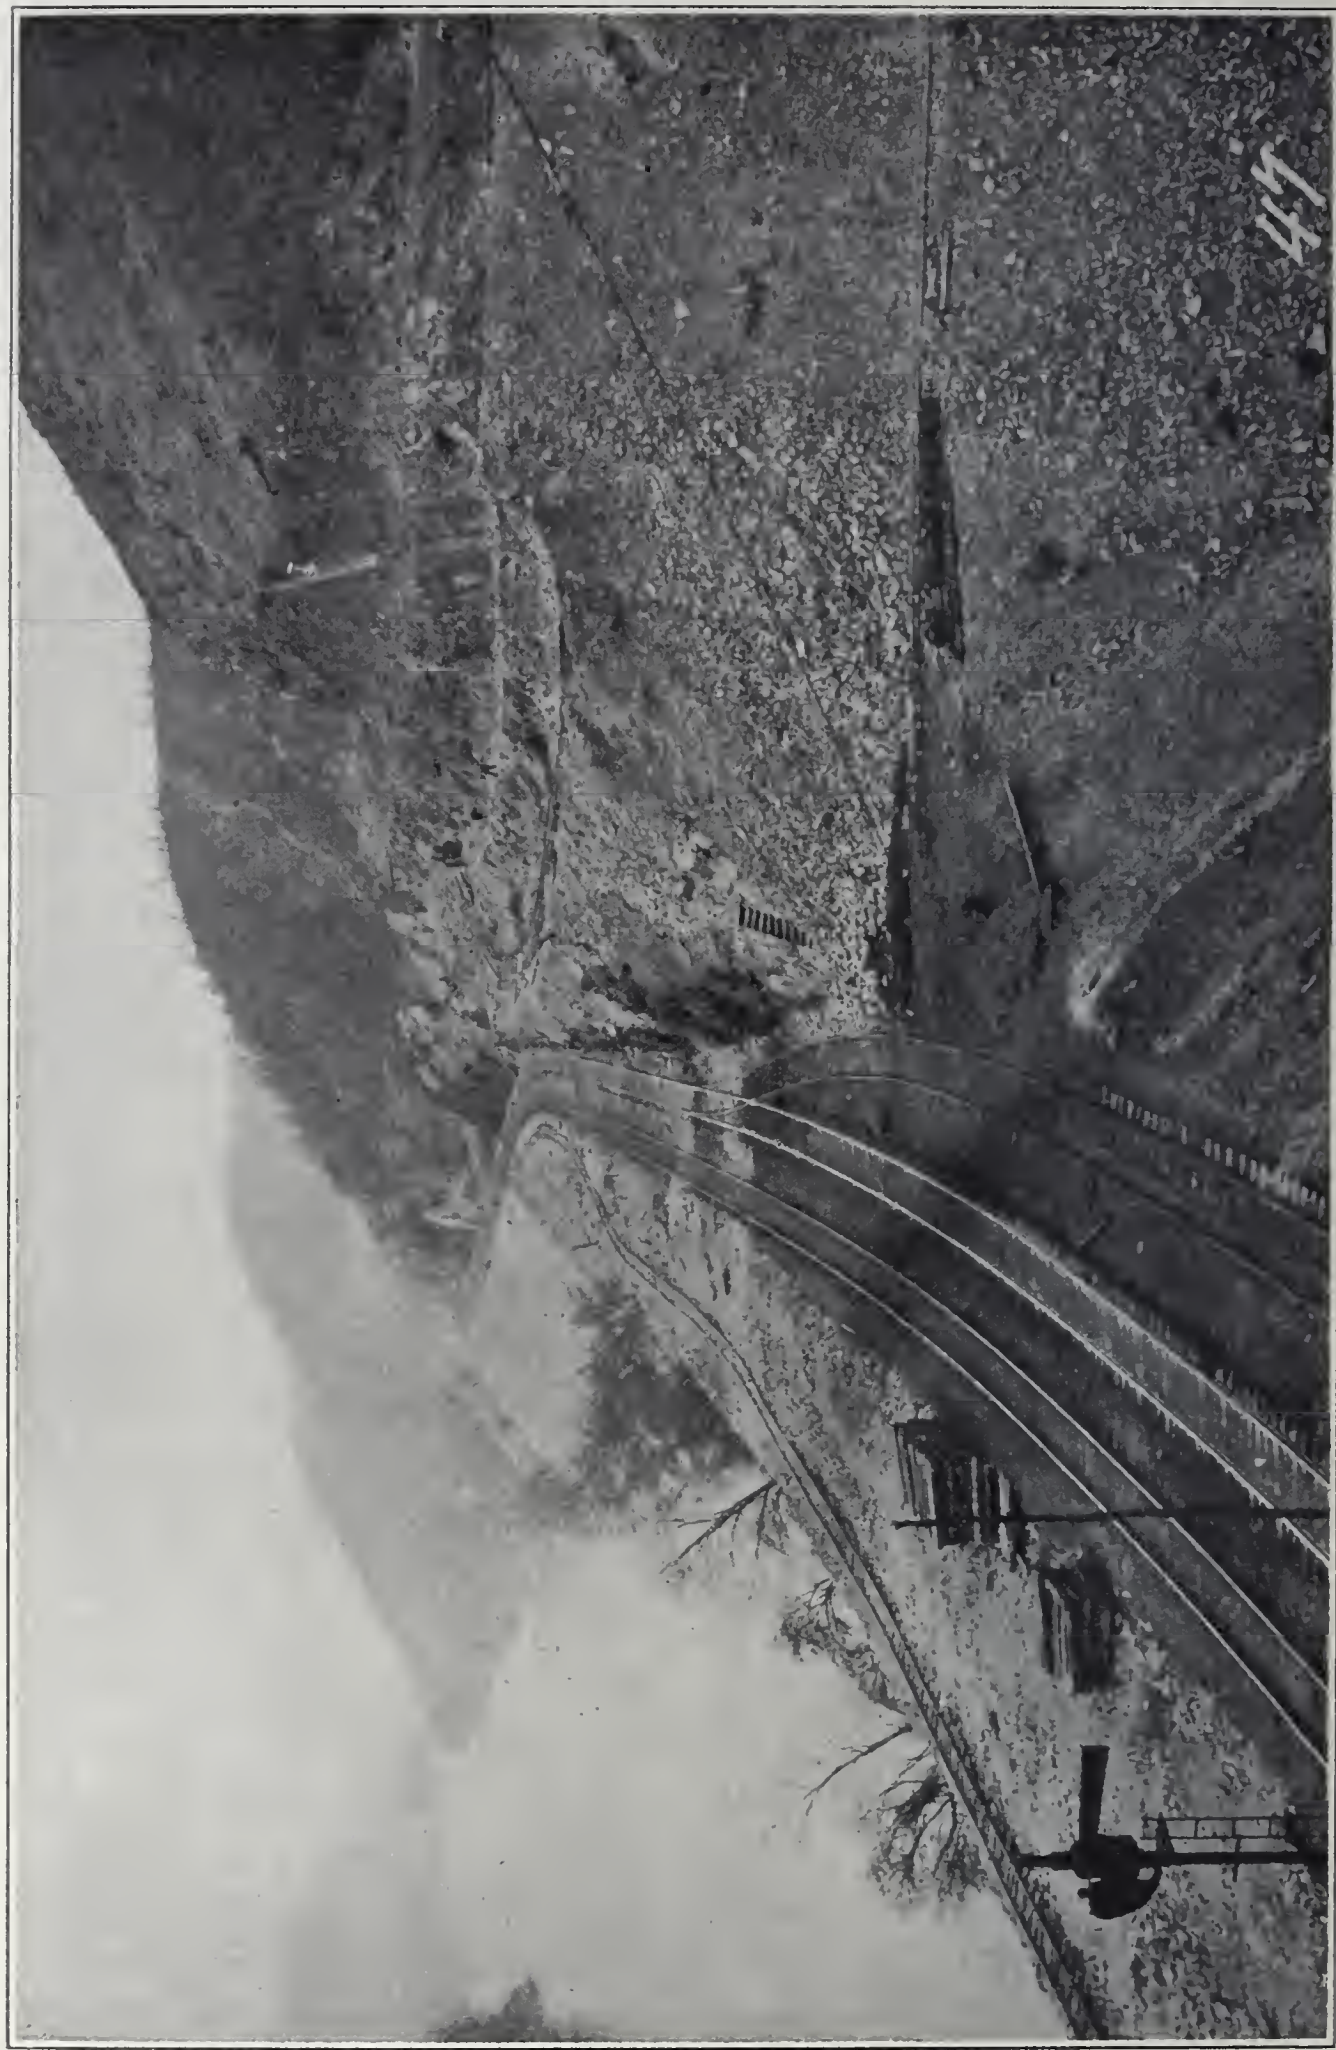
Bench—1400 ft. West of Randolph Tunnel, Looking East.
